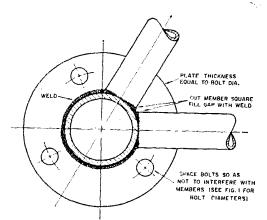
Detail sketch showing how section assembly flanges and crossbraces are welded to the vertical pipe legs. The flanges are of ordinary low-carbon steel. The outside diameter should be equal to the outside diameter of the largest vertical pipe at the joint, plus six times the diameter of the bolt used at the joint (see chart of Fig. 1). Ample wrench clearance will be provided if the center line of the bolt circle is laid out midway
